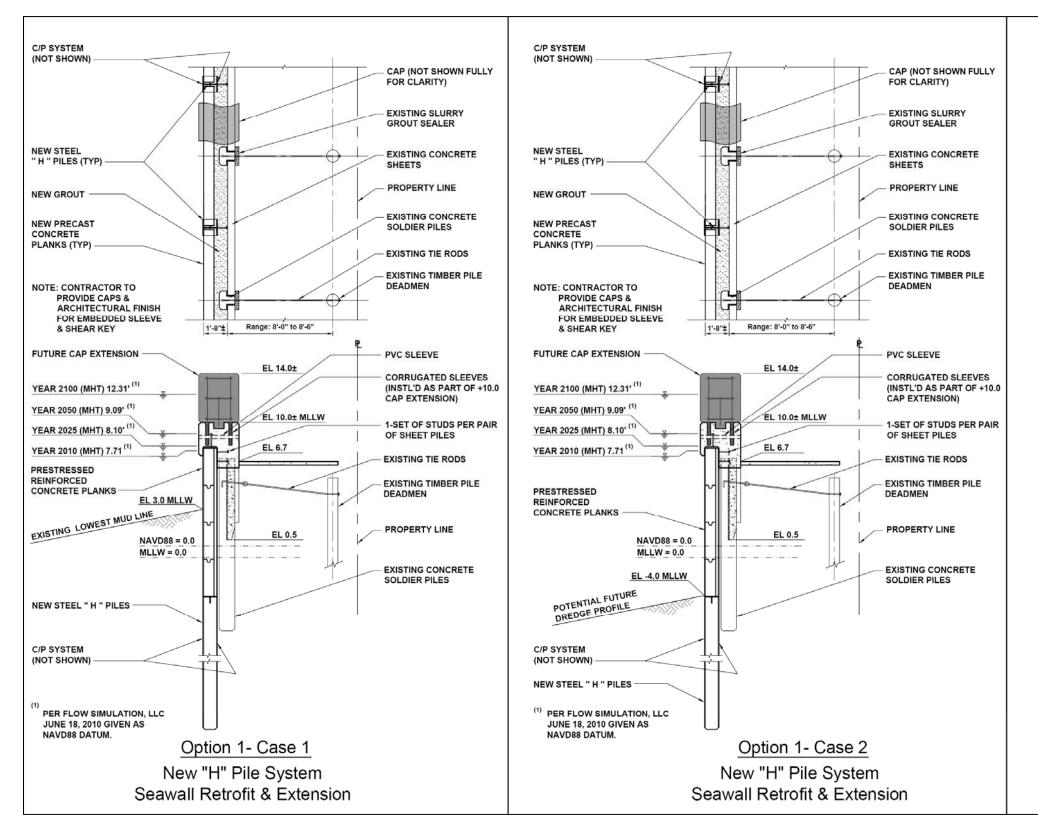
New "H" Pile System Seawall Retrofit and Extension
